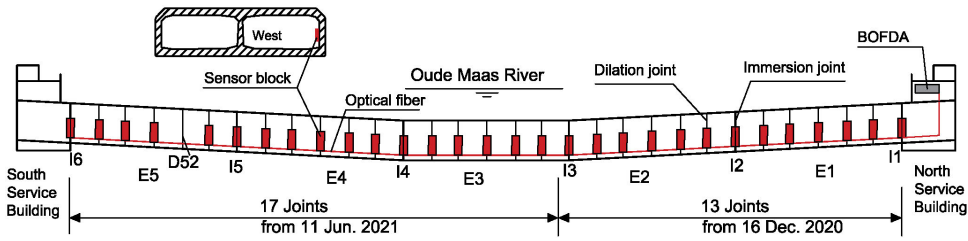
Sensor installation and monitoring at Heinenoordtunnel
